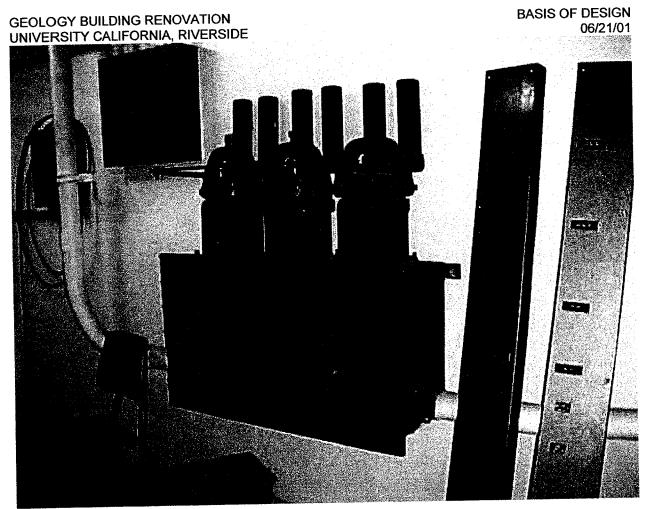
South Wing Oil Fused Cutouts (OFC)
